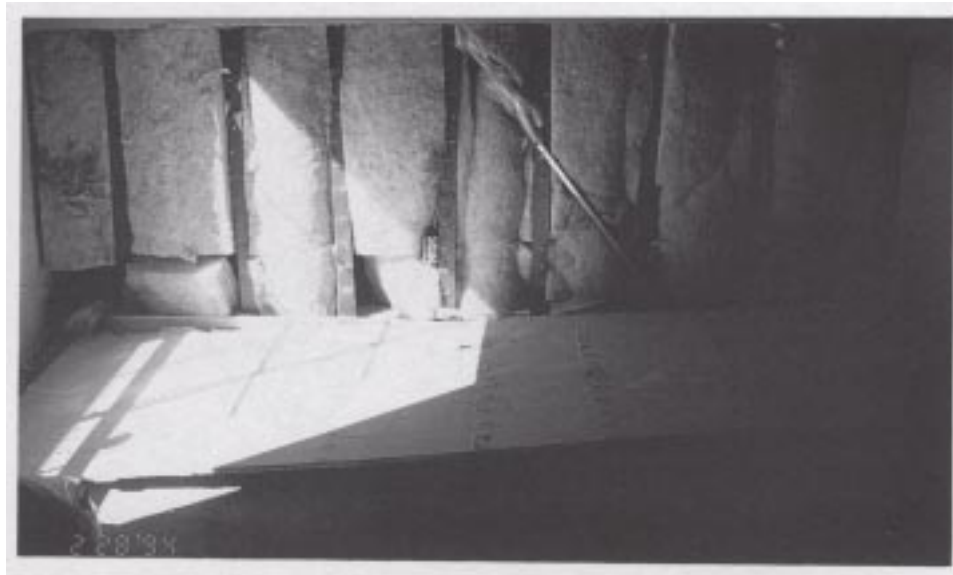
Failed gypsum wall board nailed at 3” on center to provide lateral support to first story of the building on Mammoth Avenue shown in the three previous photographs.
